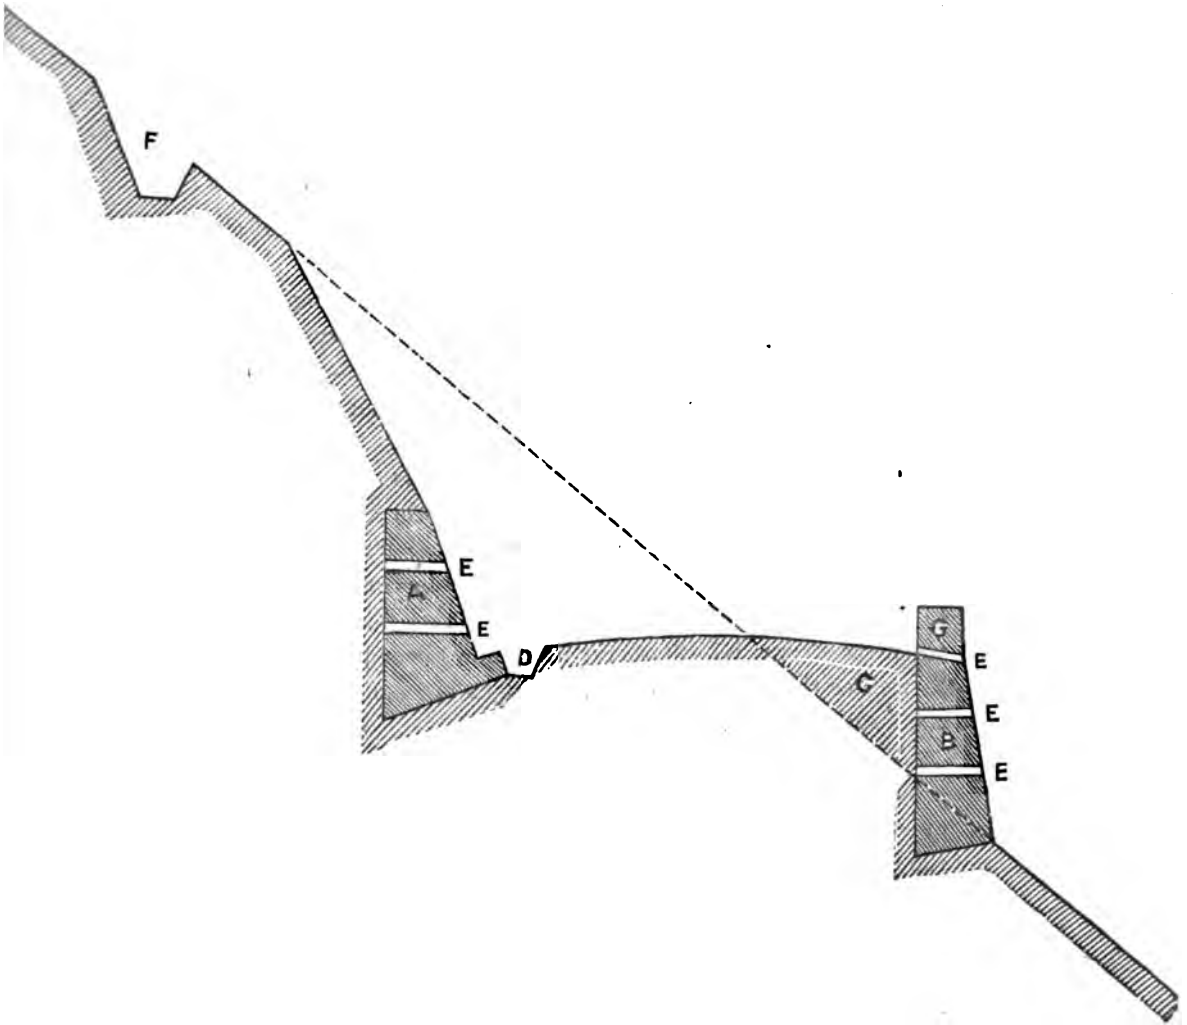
is a cross section of a road partly in cutting and partly in embankment on sidelong sloping ground. A is a breast wall to support the foot of the slope; B is a retaining wall to keep the made earth C from slipping down; D is the drain on the inside of the road; E, E are weep holes, 4 inches square, to allow the water which collects in the made earth to escape; F is the water-tight catch-water drain; G is the parapet wall for the protection of the traffic. The dotted line shows the original surface of the ground. Scale 8 feet = 1 inch.
